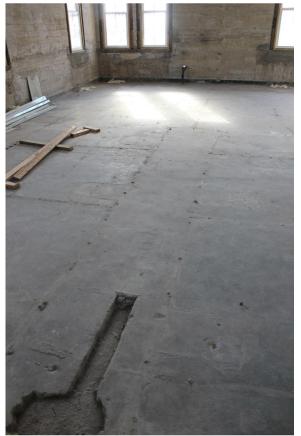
, Old Jail, Second Floor, Room 201, view of scarring at the floor from former jail cell walls and sanitary line.
